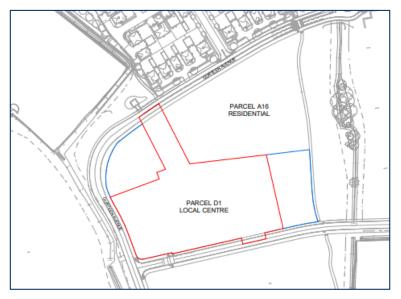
Site Location Plan (ref. GWP-PTE-XX-XX-DR-A-000100)
